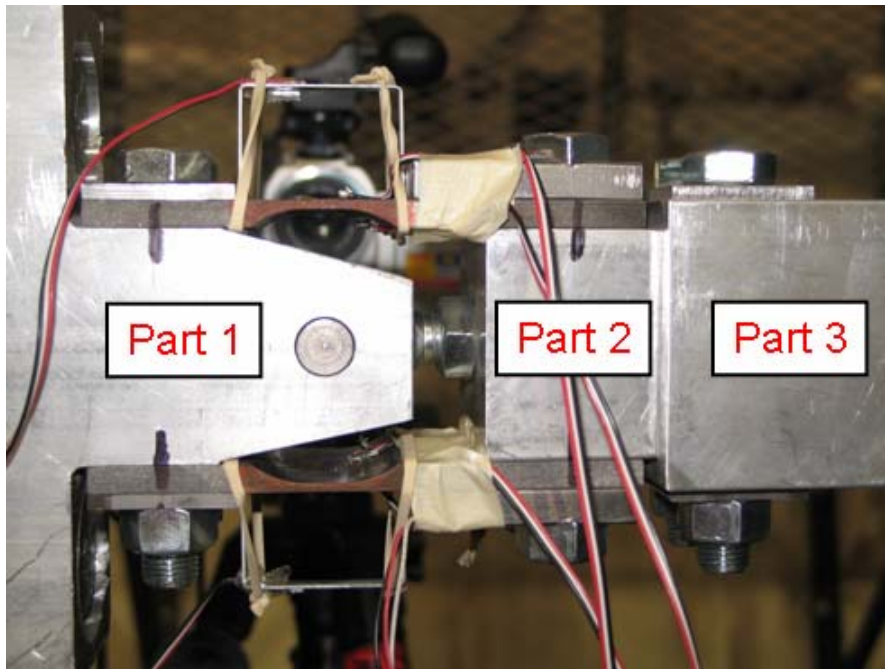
Component end of cantilever subassembly (plastic hinge region of specimen type A)
